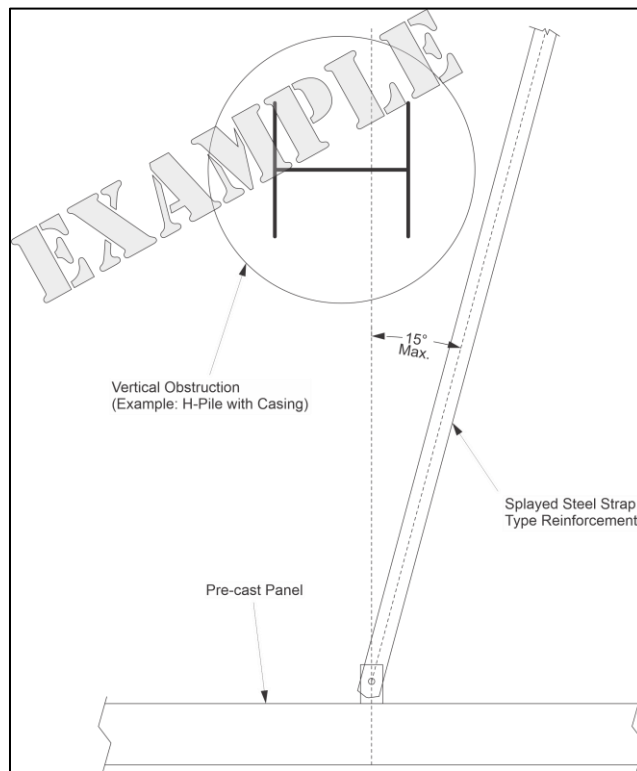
Example shop drawing detailing requirements for placing soil reinforcements to accommodate vertical obstructions
